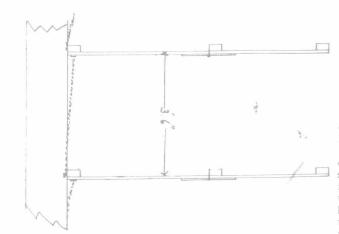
Ground-floor plan of Mr. Wells' cow stall.
